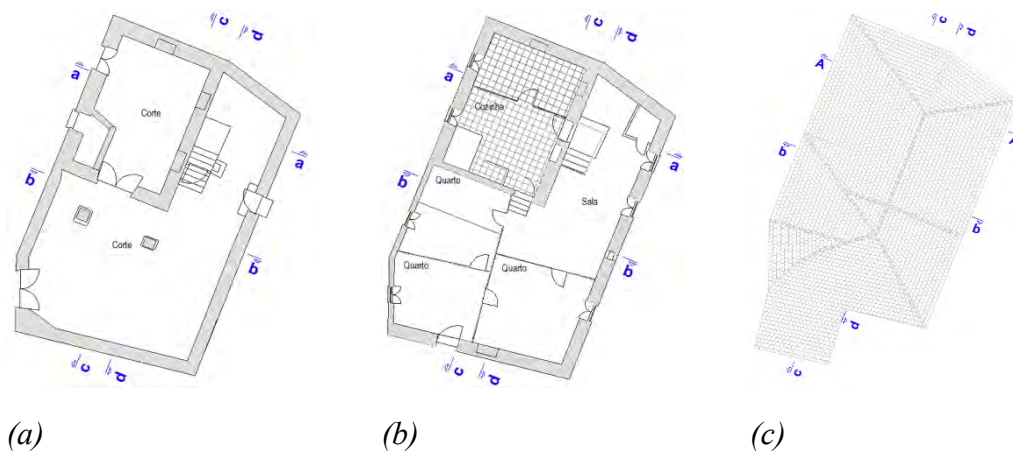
Architectural survey of the building: (a) basement plant; (b) first floor plant; (c) roof plant.
